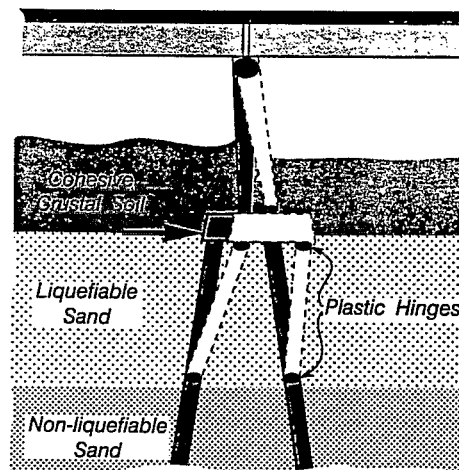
Limit equilibrium evaluation of foundation of Land Road Bridge during 1987 Edgecumbe, New Zealand earthquake (Berrill et al., 1997).
